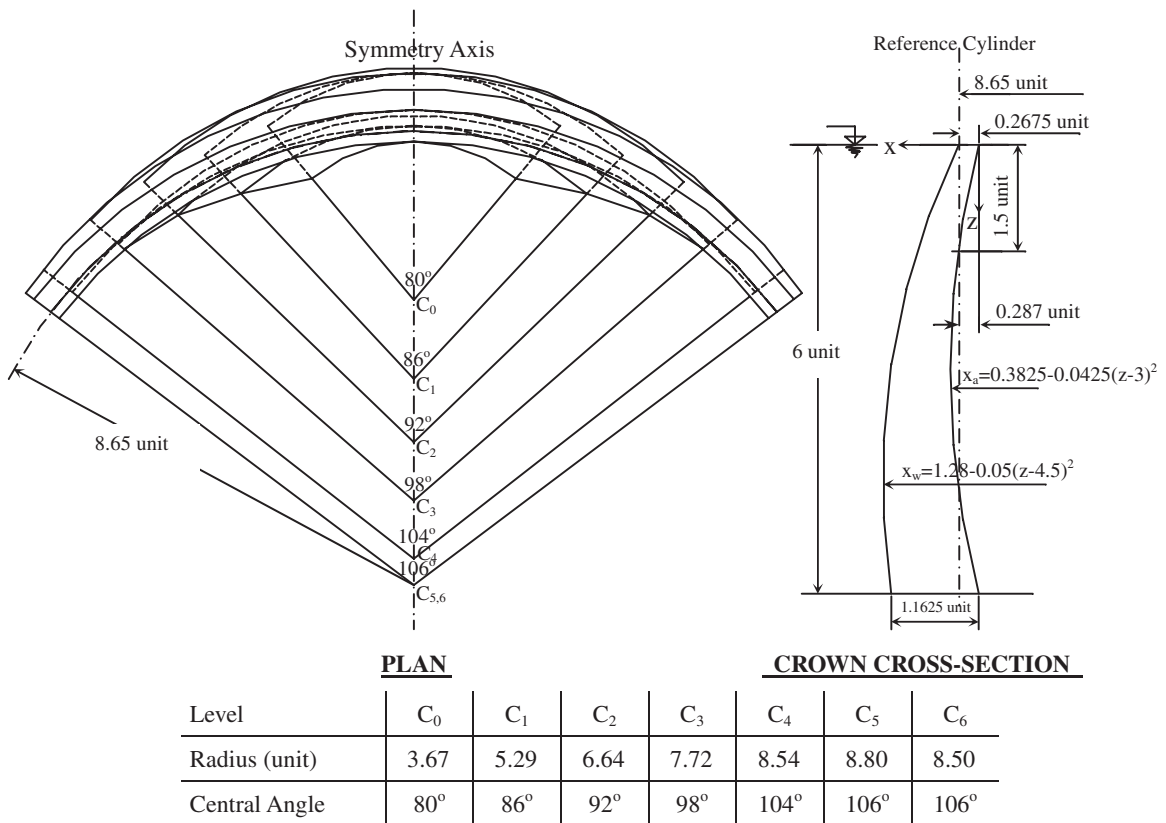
The view in plan and vertical crown cross section of Type 5 arch dam (ICE, 1968).
